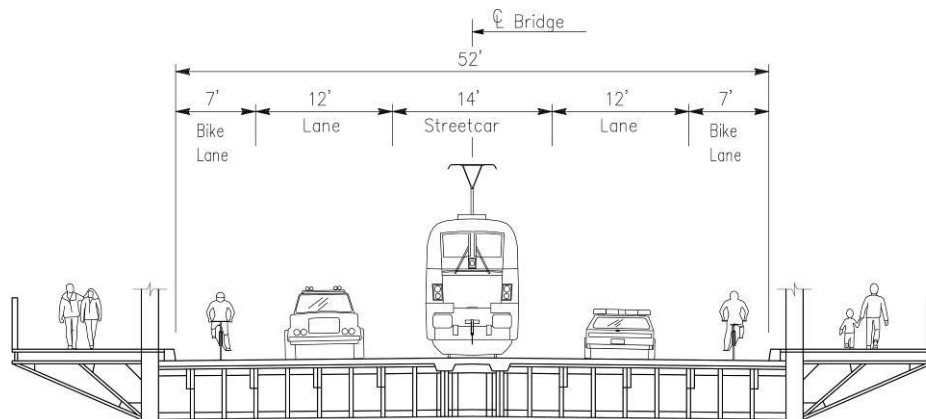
Typical section of Tower Bridge showing lane configuration Alternative 2 - one through traffic lane in each direction and one dedicated streetcar track with shoulders/bike lanes.
